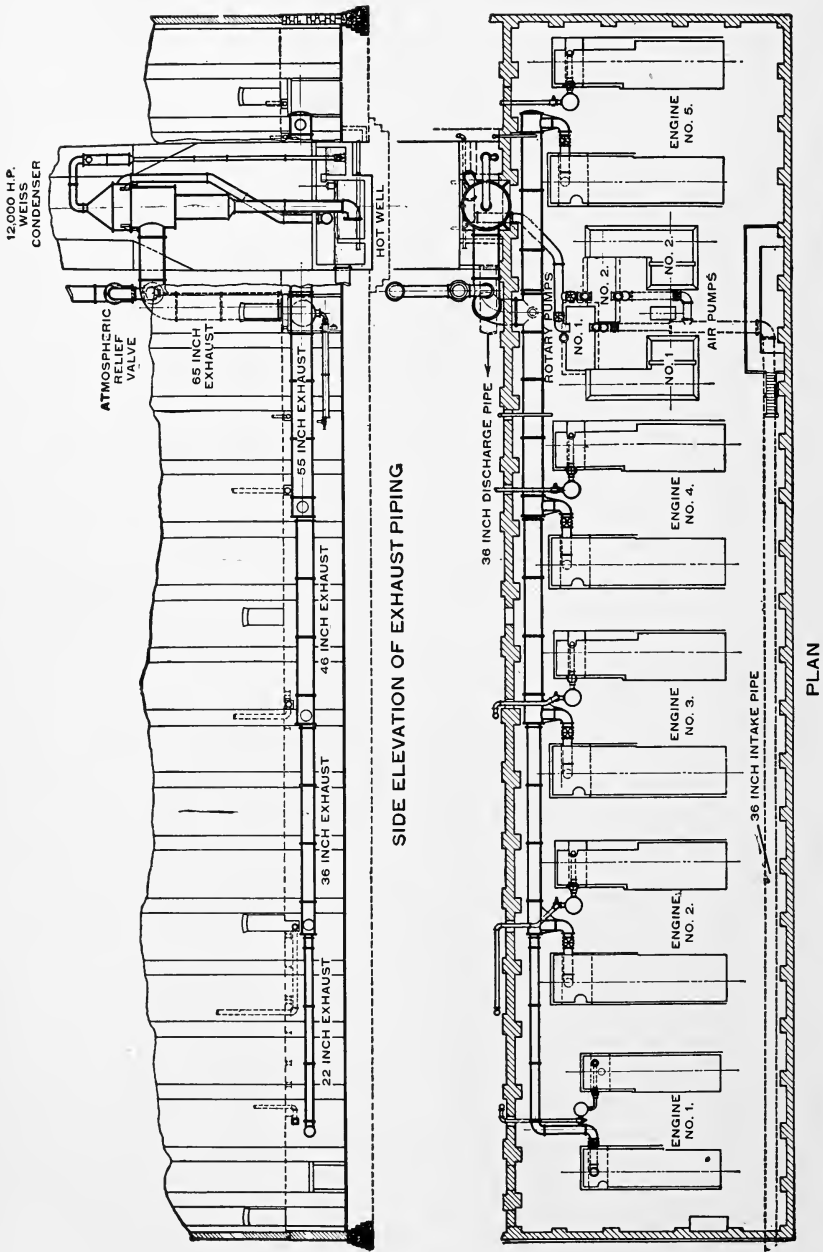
Condenser and Exhaust Steam Piping at the Northwestern Elevated R.R. Power House, Chicago, Ill.
